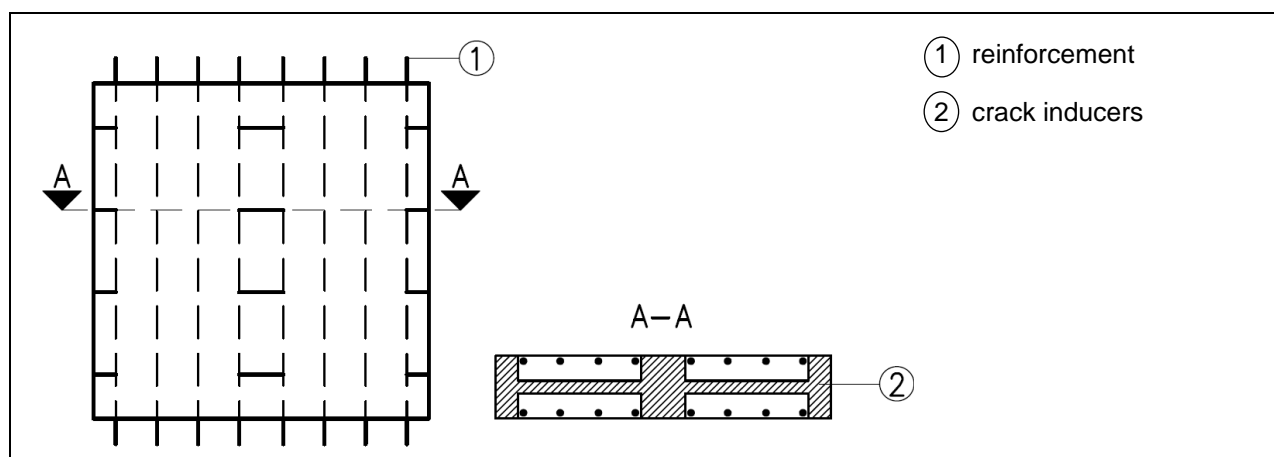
Example of a test member for plastic anchors tested in cracked concrete
